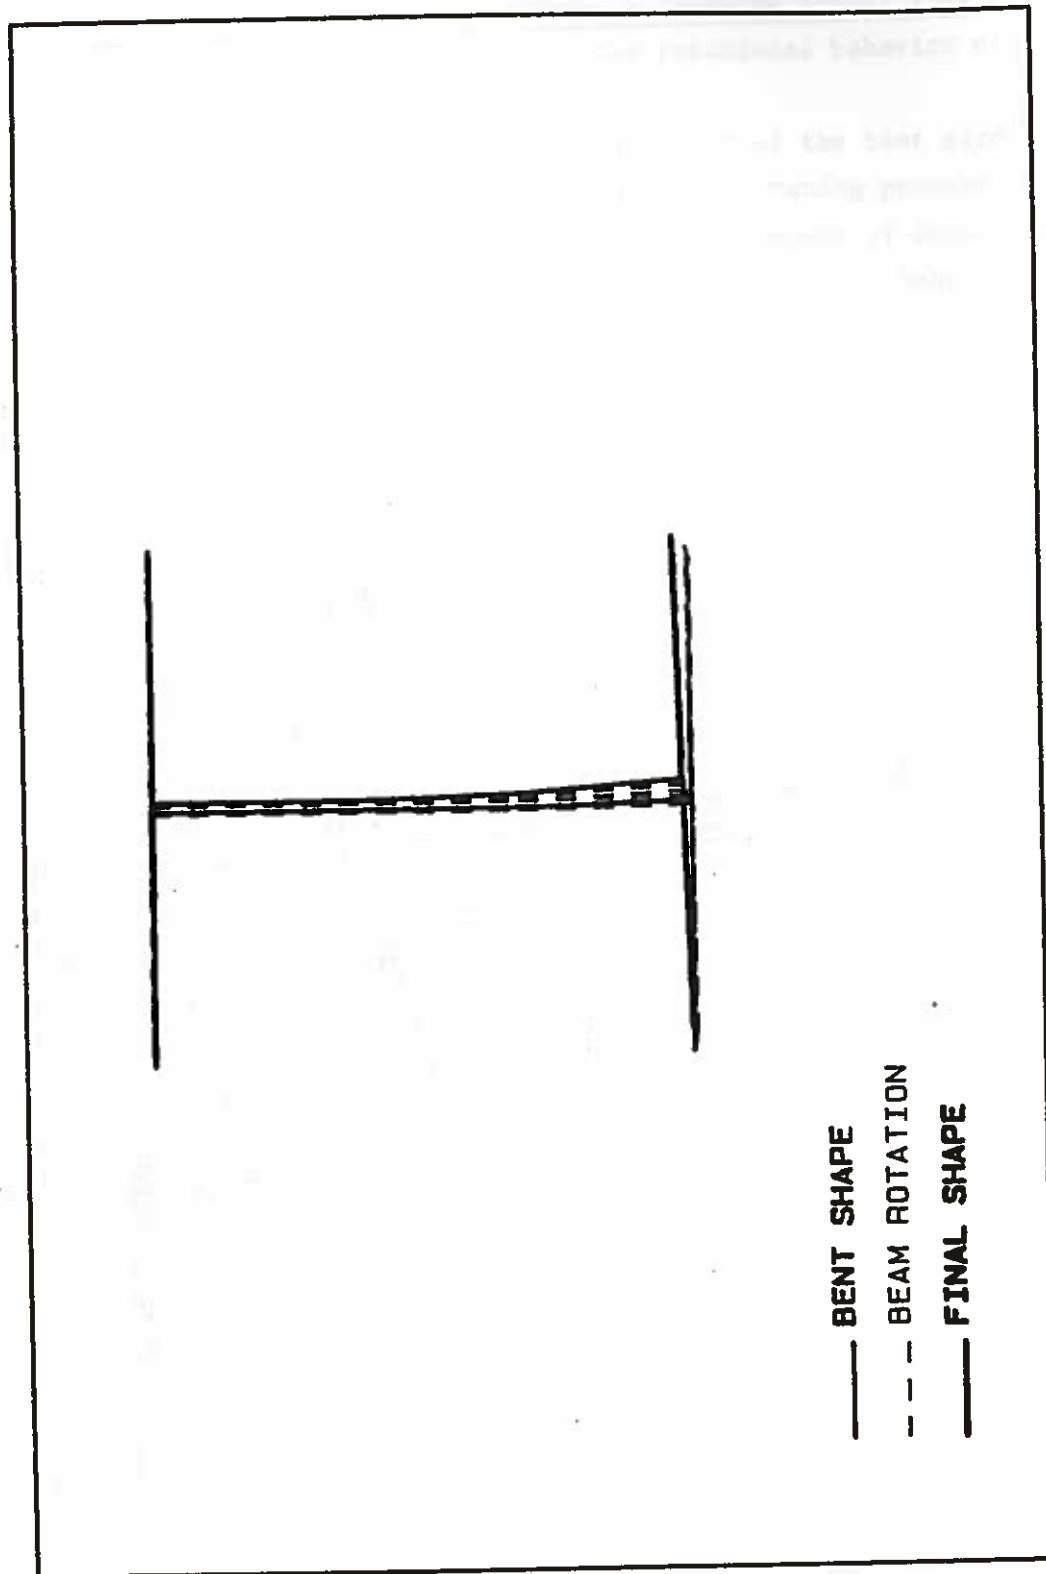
Rotational heat-straightening progression of the damaged girder specimen SB-1 (section at point 1).
